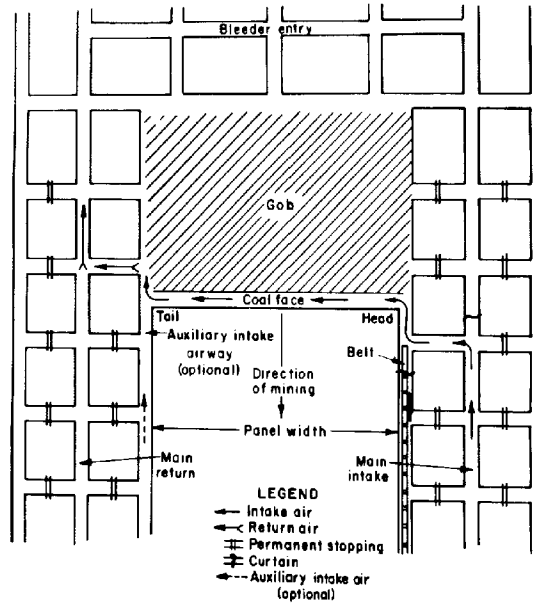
Schematic of a multiple entry retreating longwall mining system.
